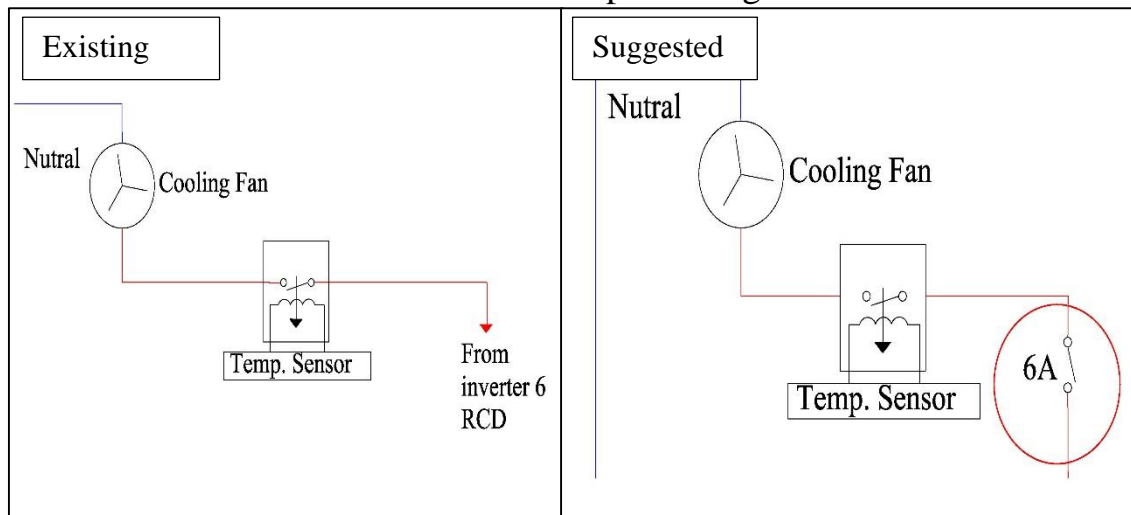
Electrical Wiring for Air Forced Ventilation System
